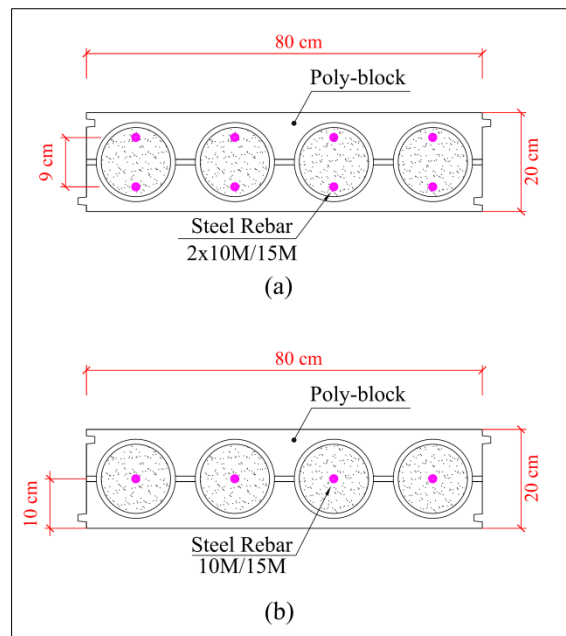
Rebars arrangements in poly-block, a) two rebars in each core, b) one rebar in each core
